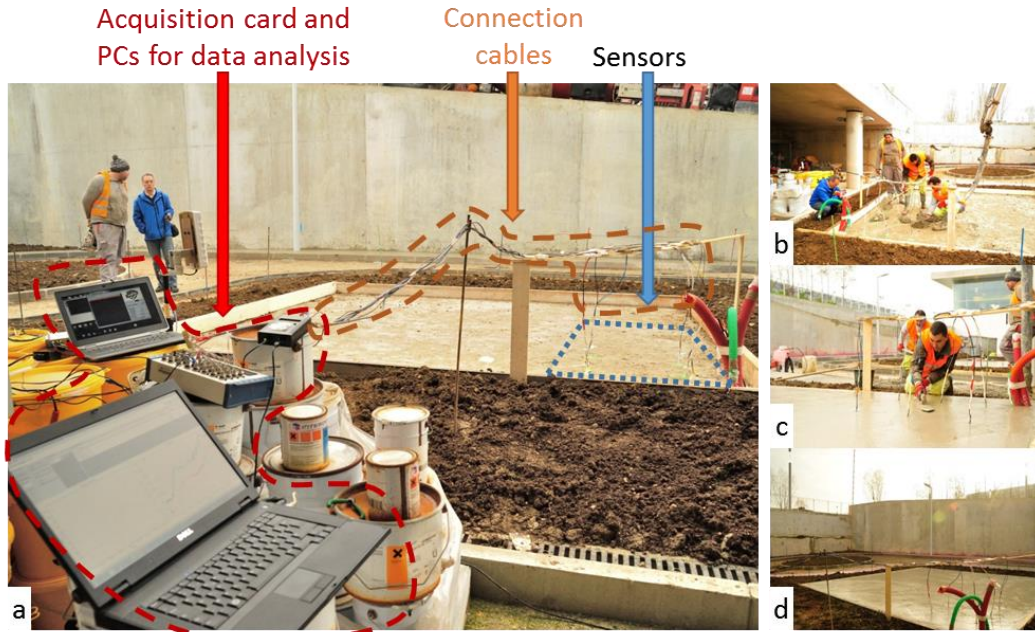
Phase of concrete pouring. a) All sensors are in place and ready to be embedded. We can see the cable connections to the acquisition card and the computers for continuous measurement. b) Concrete is manually positioned around the sensors to ensure that no damage is caused to them. c) The surface of the poured concrete is smoothed. d) The concrete slab after the process. We can see the cables exiting the surface of the concrete.
